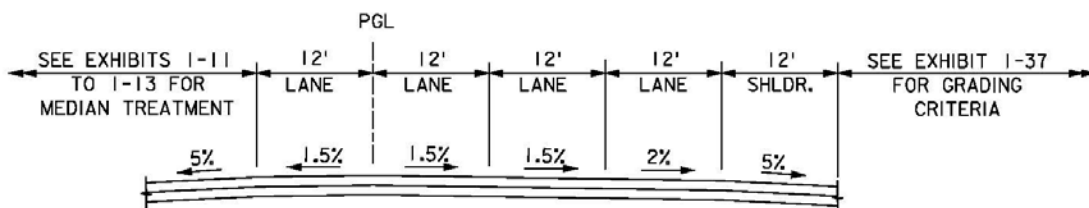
Mainline Roadway Typical Sections (Normal Sections)
